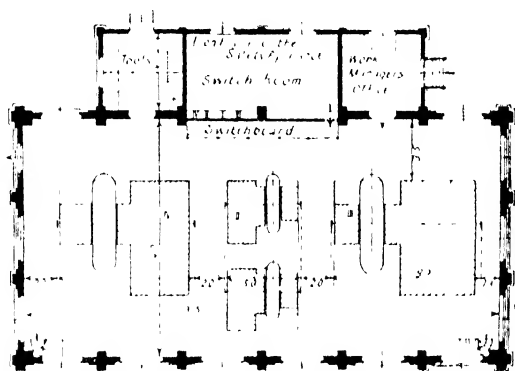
Ground plan of the Lauchhammer briquette factory power plant.
